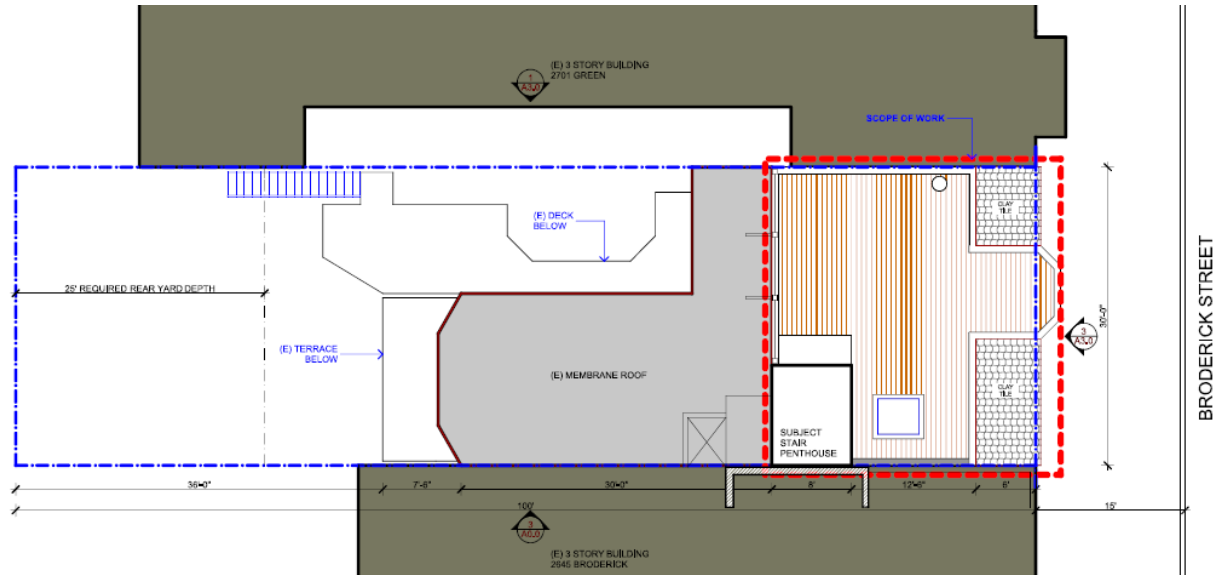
Roof Plan showing scope of work under "Permit 2" (from DNM Architect)
